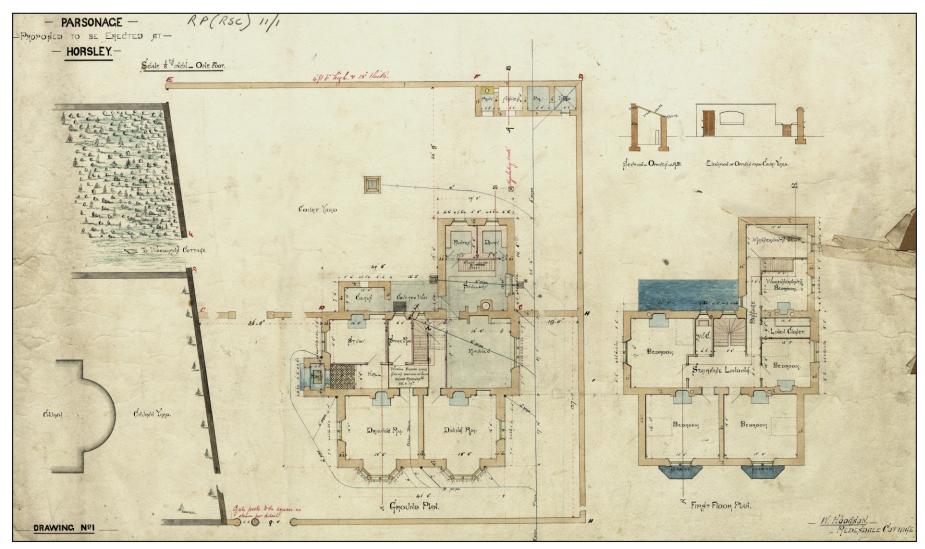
Plans relating to the construction of a parsonage at Horsley, 1880's (ROC M&D 026)
